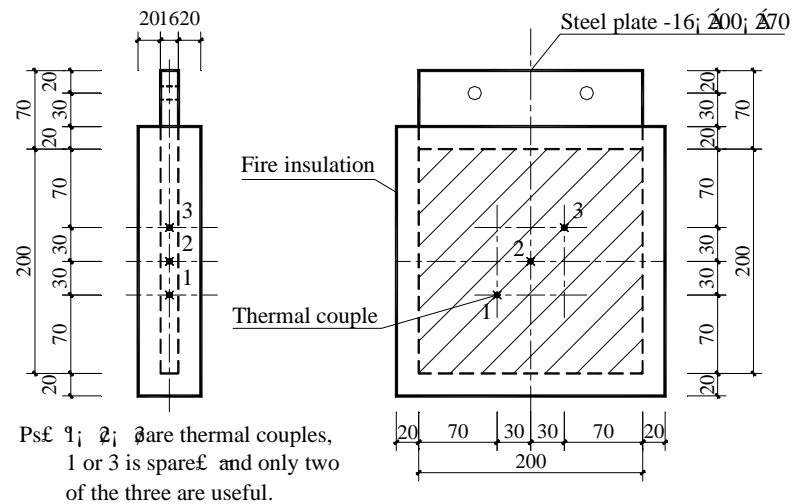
Dimensions of specimens and arrangement of thermal couples
